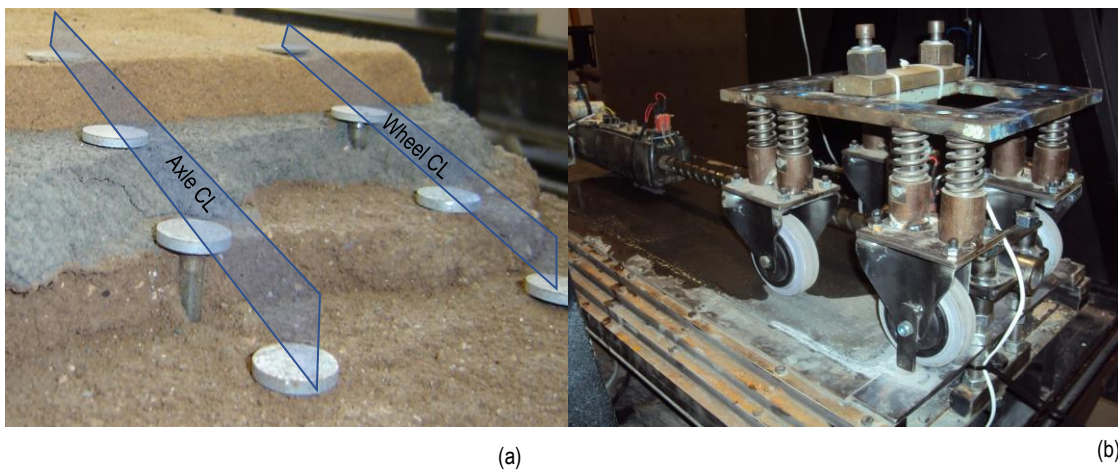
Testing setup with a) the LVDT locations and b) load application setup
